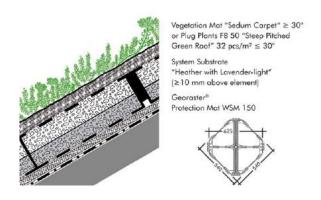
Construction Detail of Pinched Green Roof Up 35° (source :zinco-greenroof.com)
